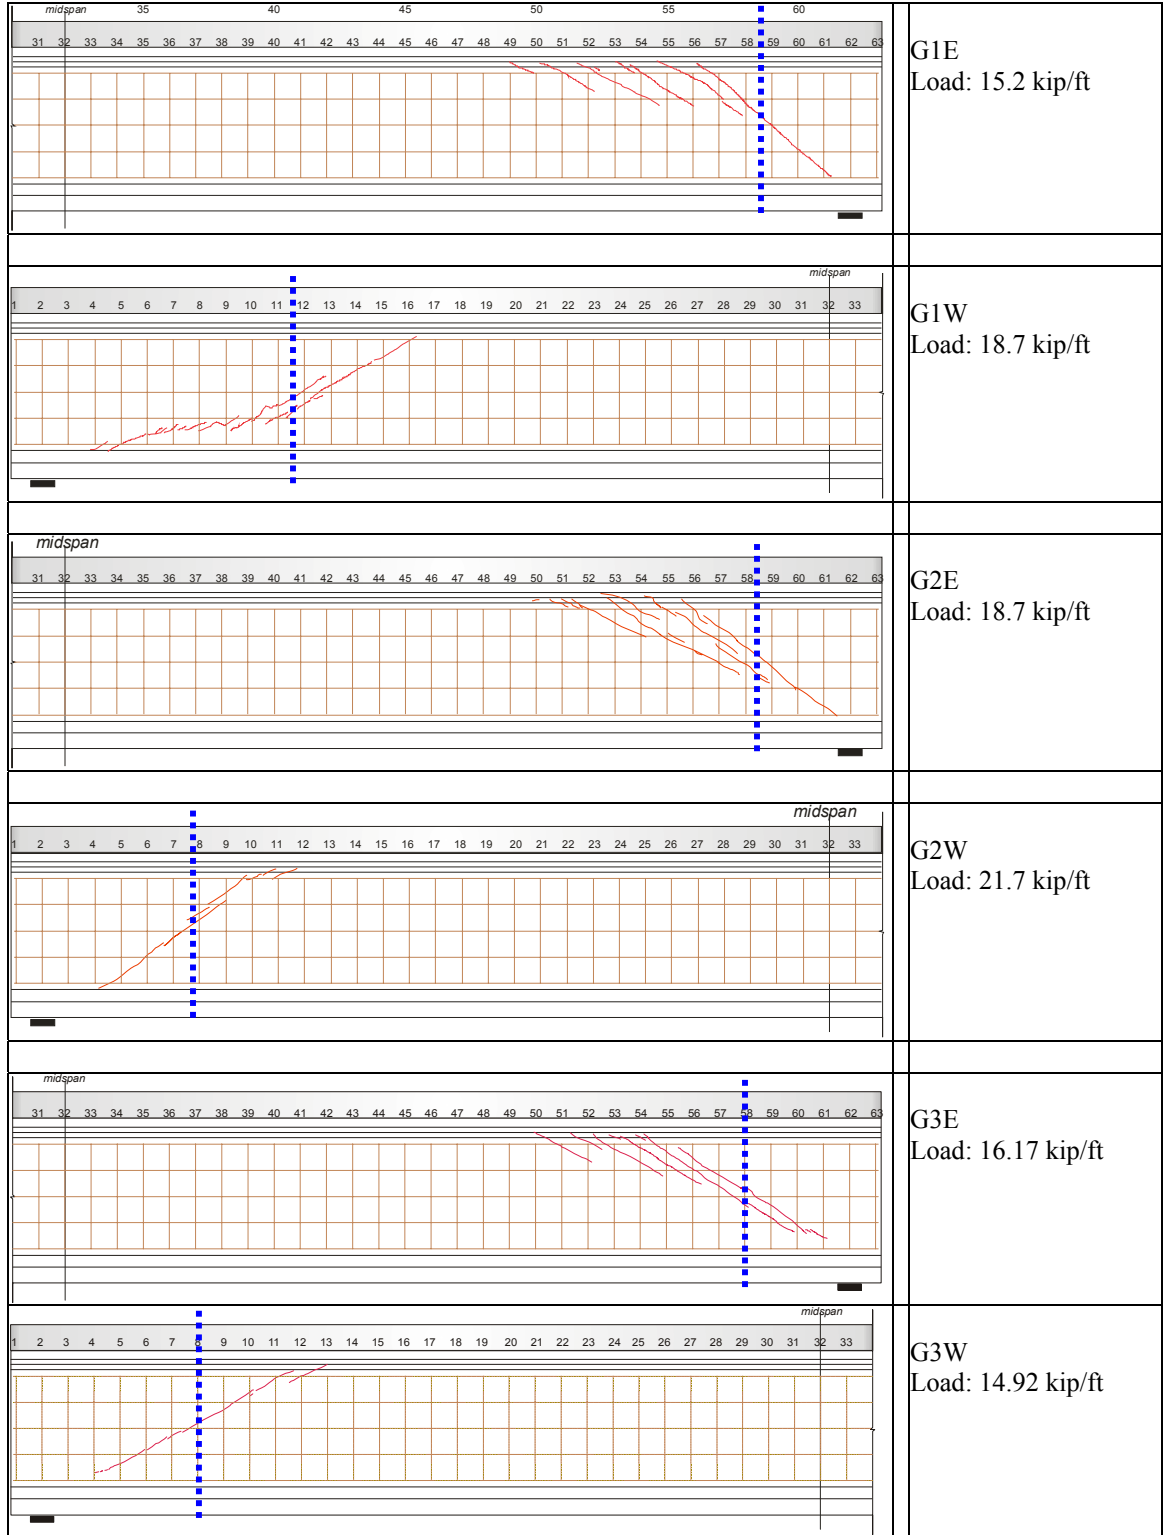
Web-Shear Cracks for NCHRP 12-56 Girder Tests
